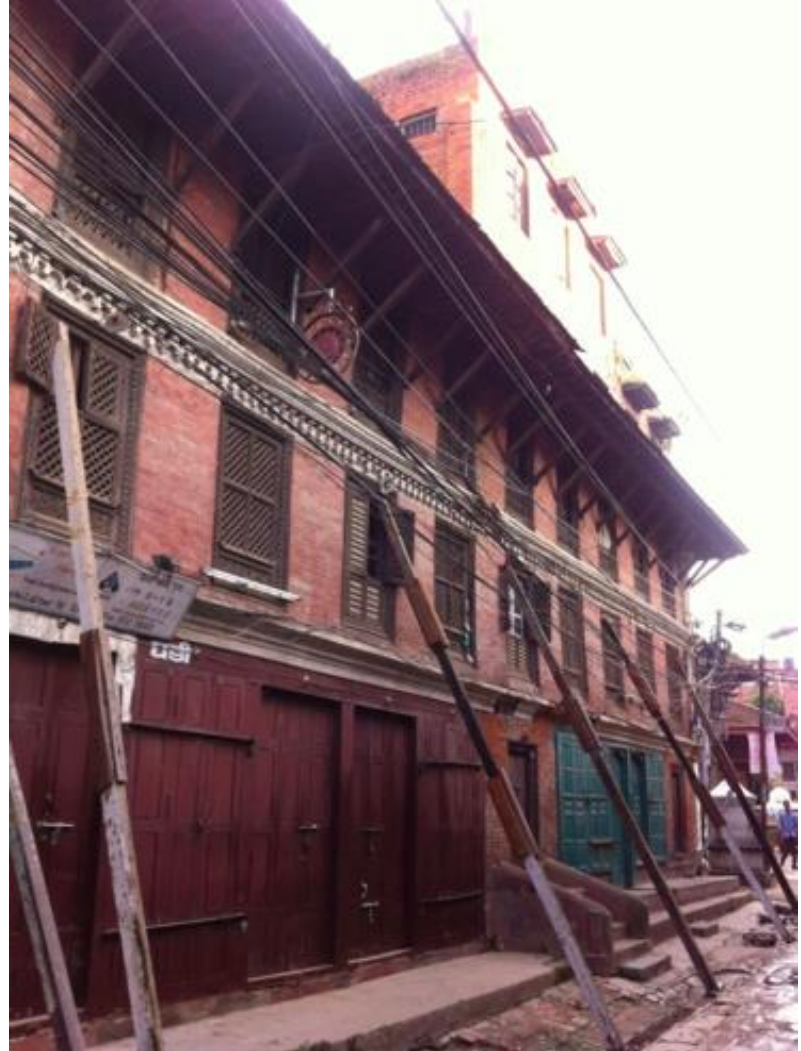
Traditional brick masonry building (Shock Safe Nepal group 1)
